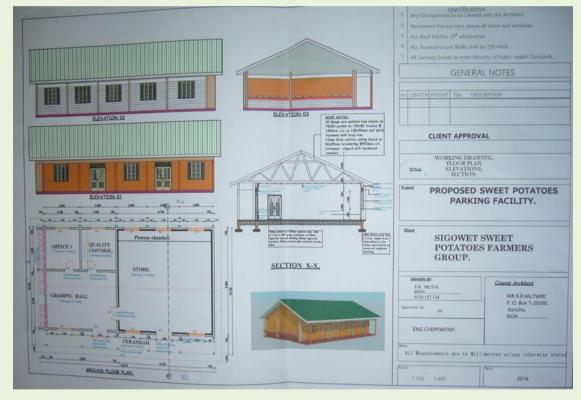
Plan of Kericho County SP fresh root pack-house and storage facility
